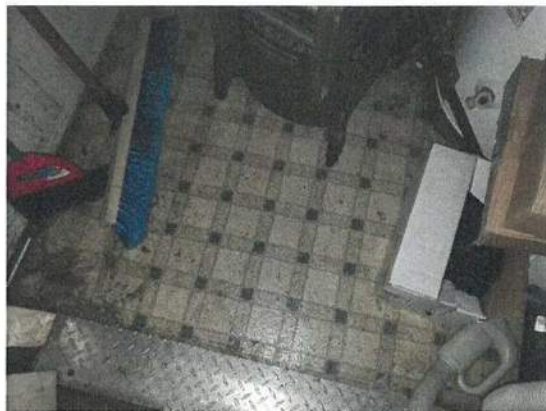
Sheet Vinyl Flooring – Cleaning Closet (ND)
